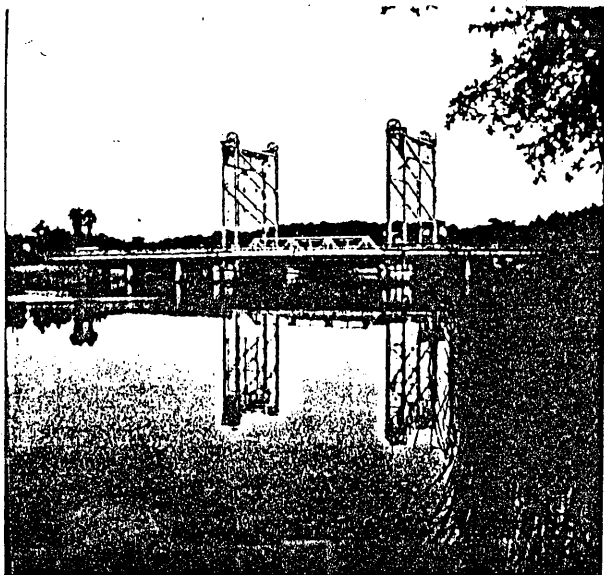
EXISTING VERTICAL LIFT BRIDGE AT HILLSBOROUGH RIVER
